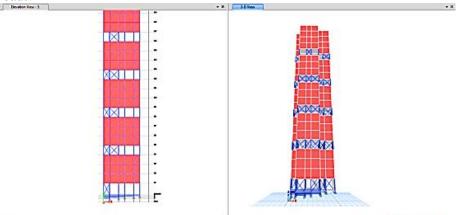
Elevation & 3D view of the building with bracings at 4th+8th+12th floors on 5° sloping ground
